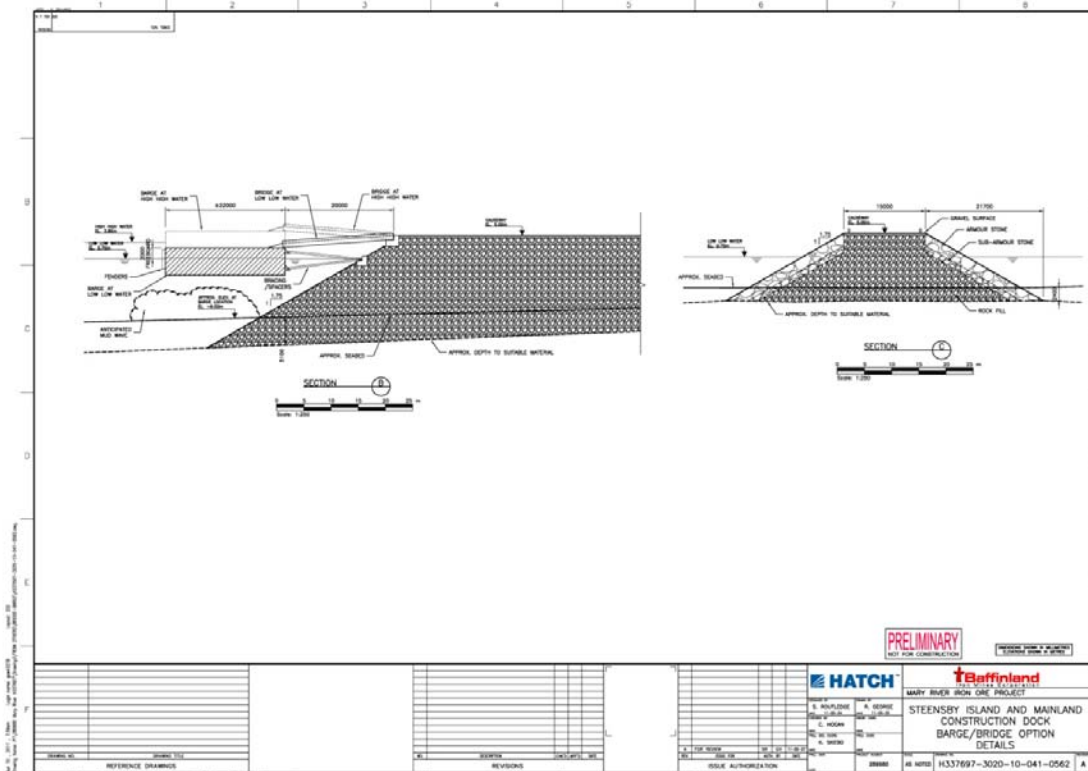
Steensby Island and Mainland Construction Dock Bridge / Barge Option Details.
